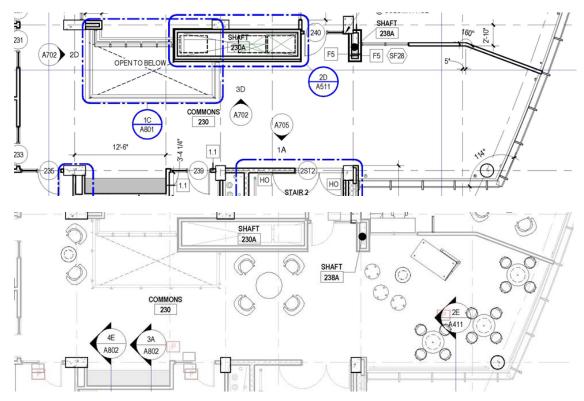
| 2nd Floor Commons Floor and Furniture Plans
